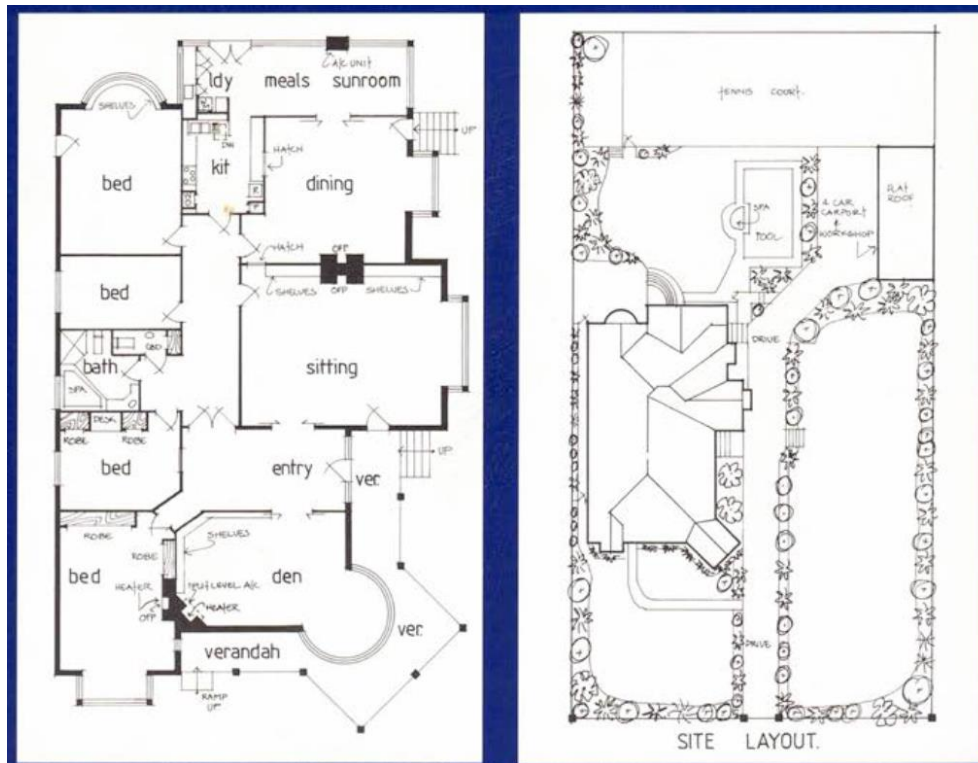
Floor plans and site plan of 57 Berkeley Street included in the 1994 auction advertisement
